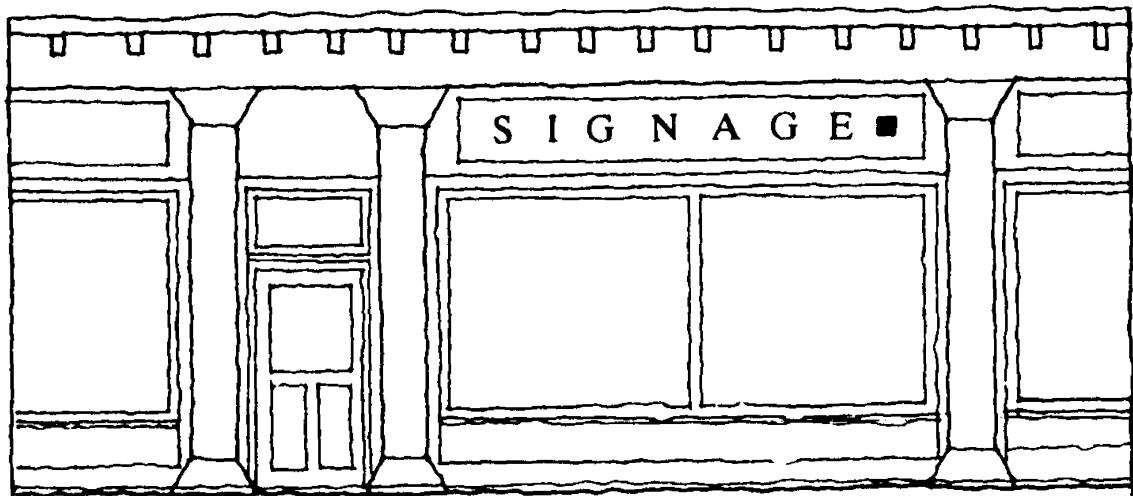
Signs should be architecturally compatible with a building's facade.
